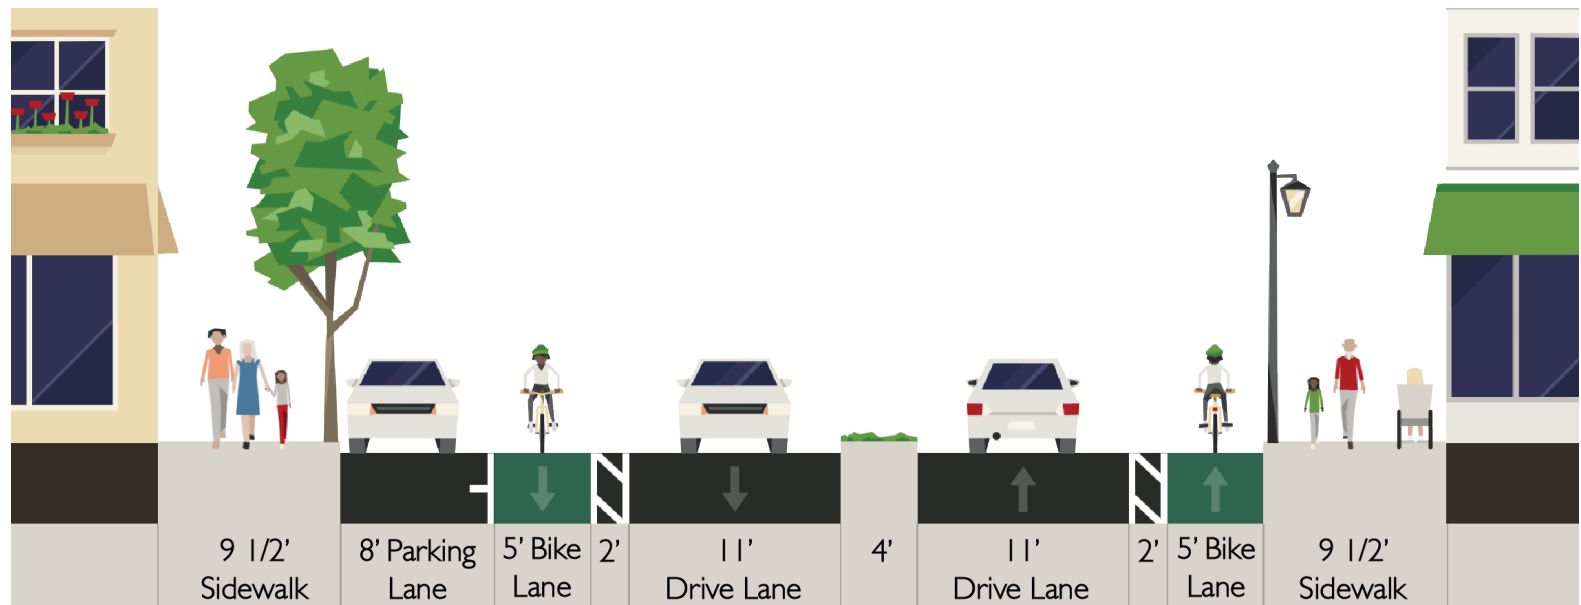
Highway 12 Cross Section B (No Center Lane, Parking on One Side)
